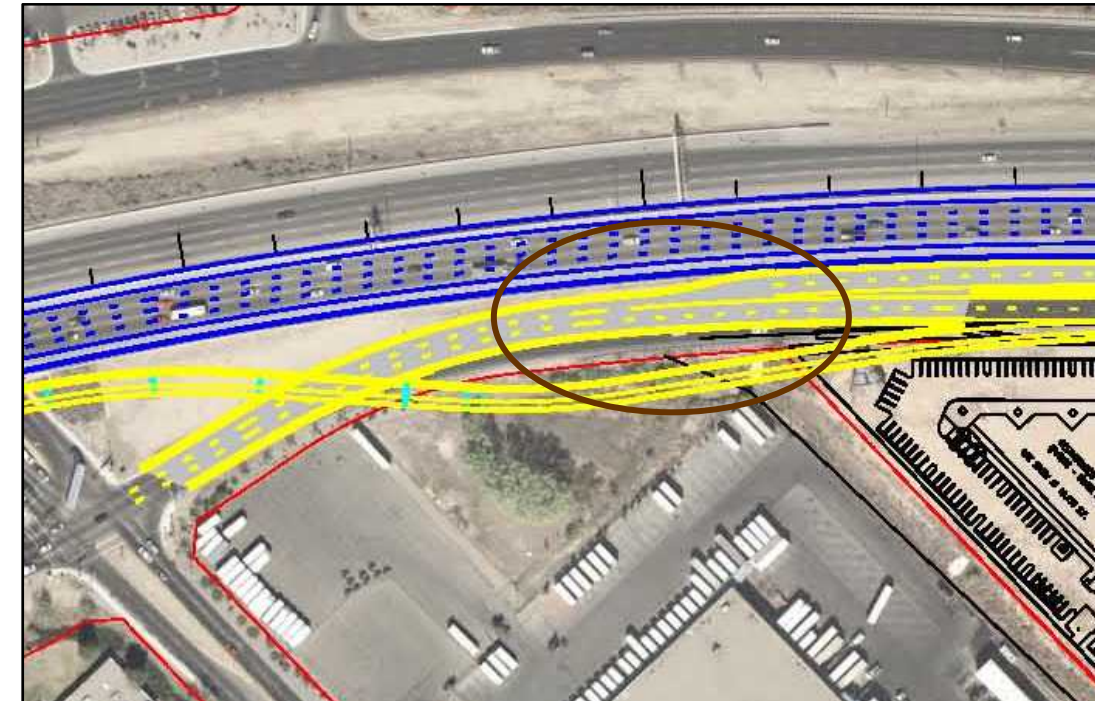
, Eliminated On-Ramp/Frontage Road Junction for Ramp Metering
